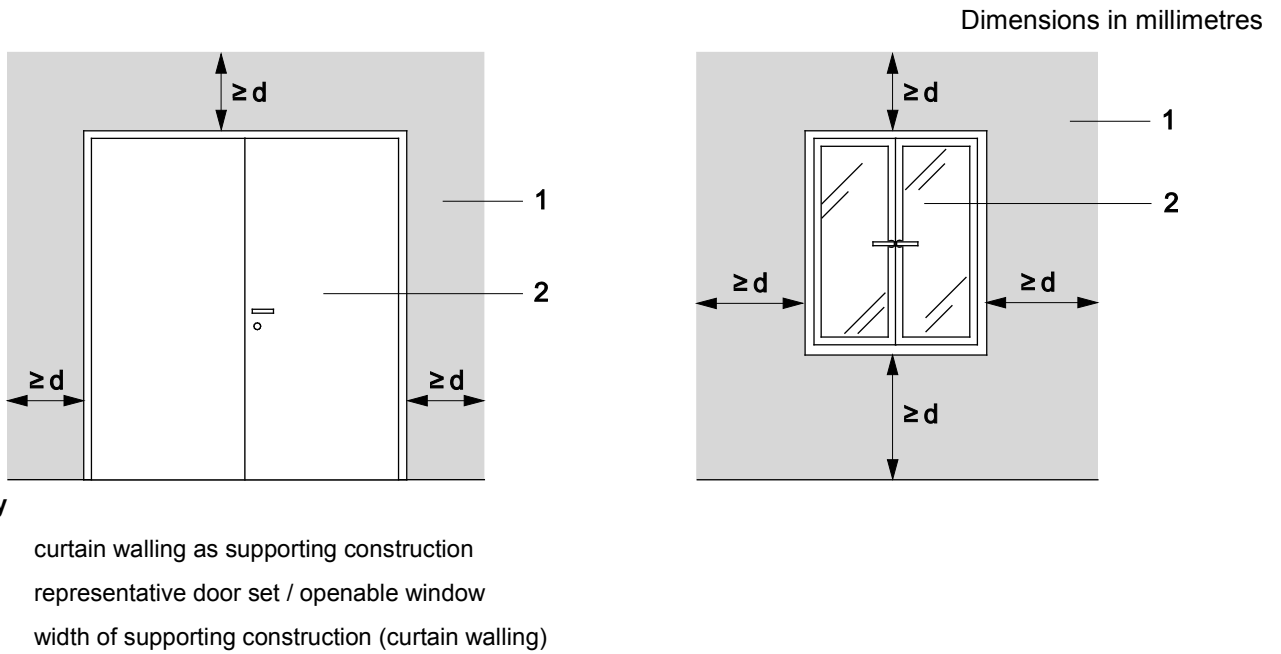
Test configuration for doors/windows to be included in a curtain walling
